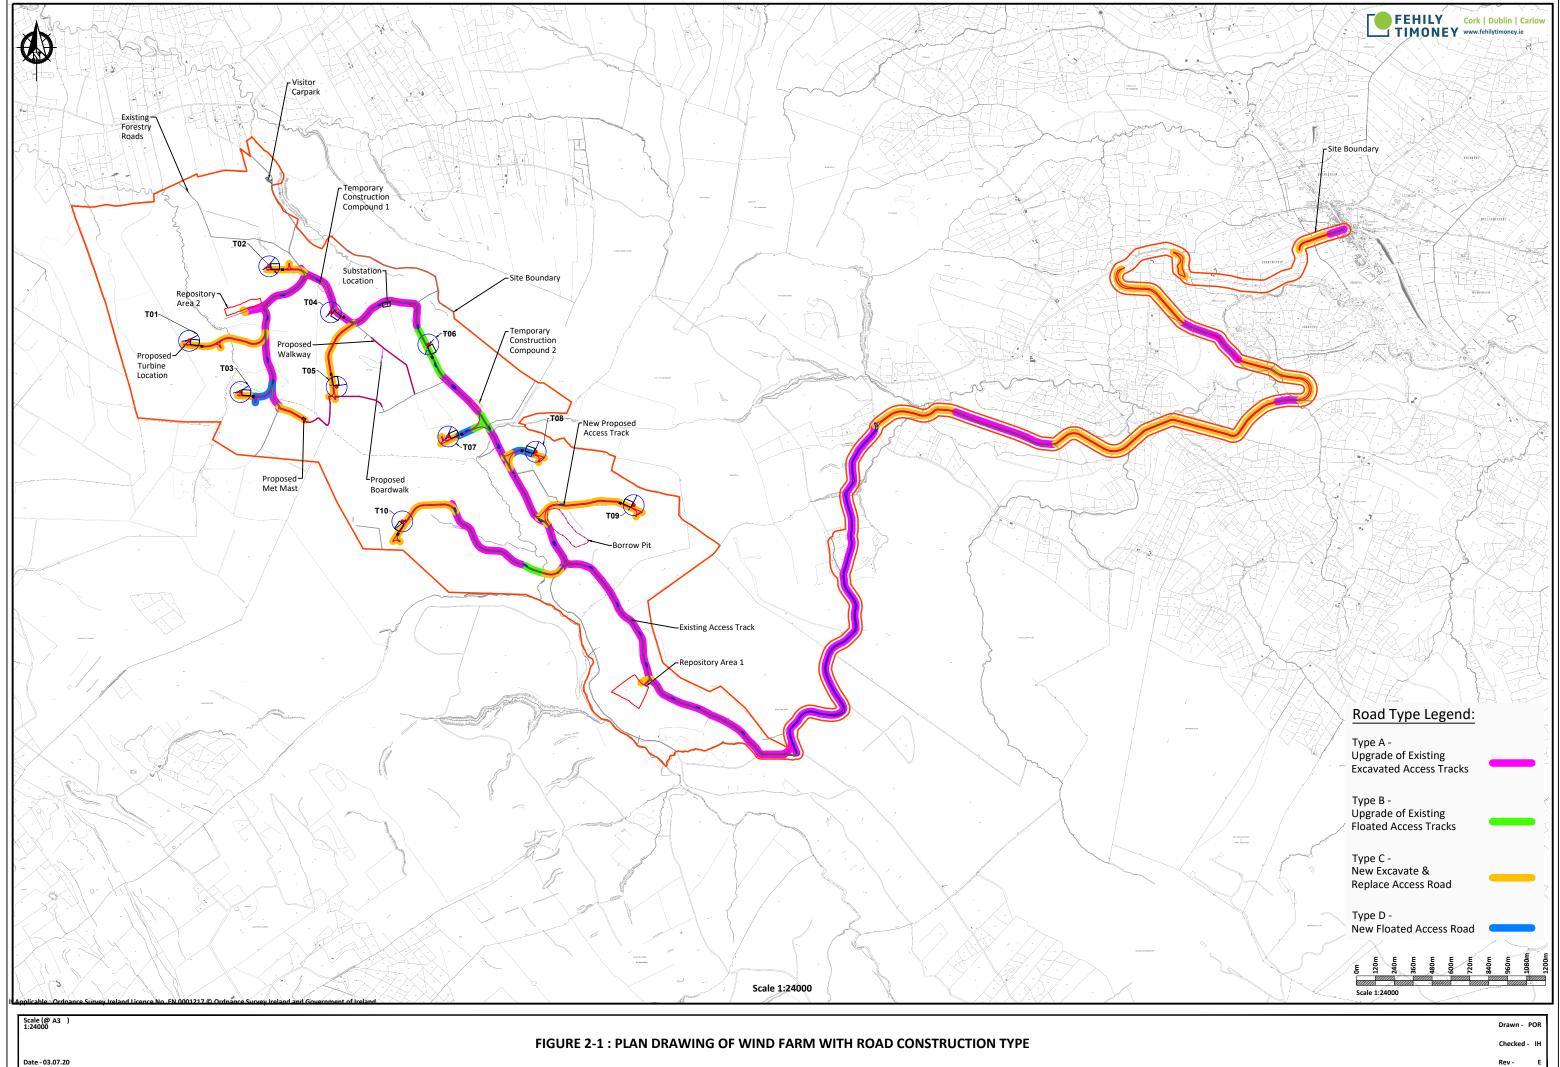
Plan Drawing of Wind Farm with Road Construction Type
